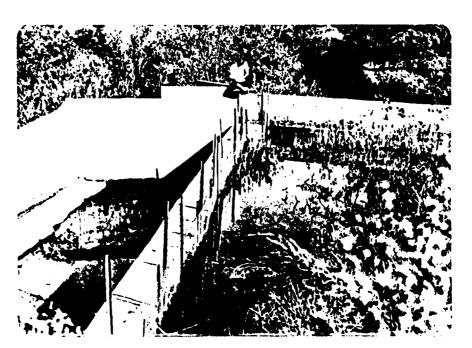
Picture of concrete overflow crest of service spillway taken at left side of spillway.
